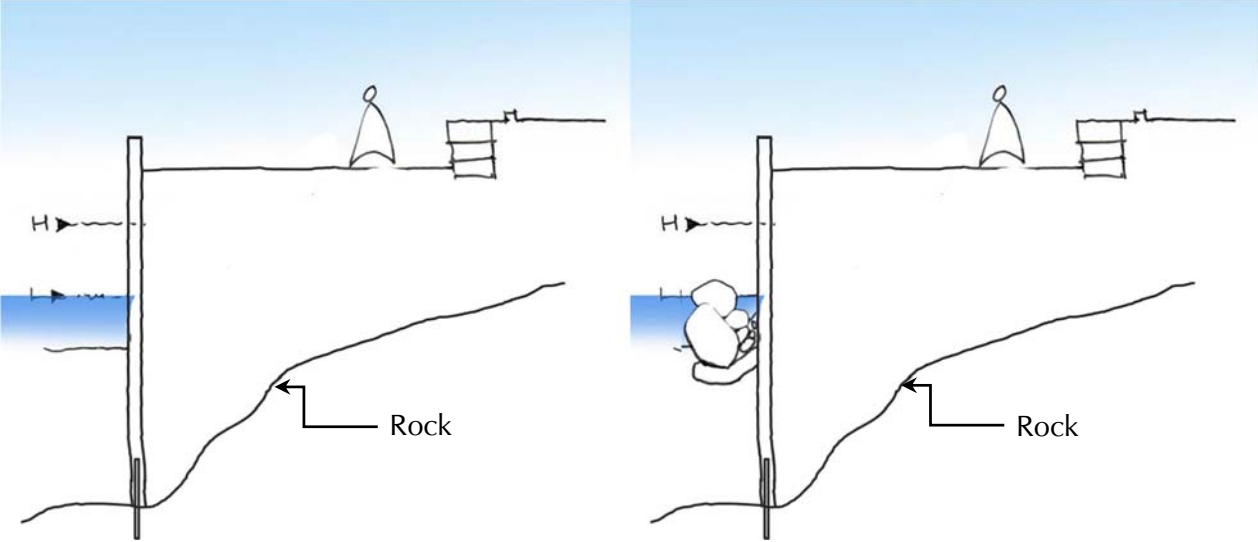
Examples of Sheetpile Construction, Shallow Rock - Toe Pin and Riprap Toe
